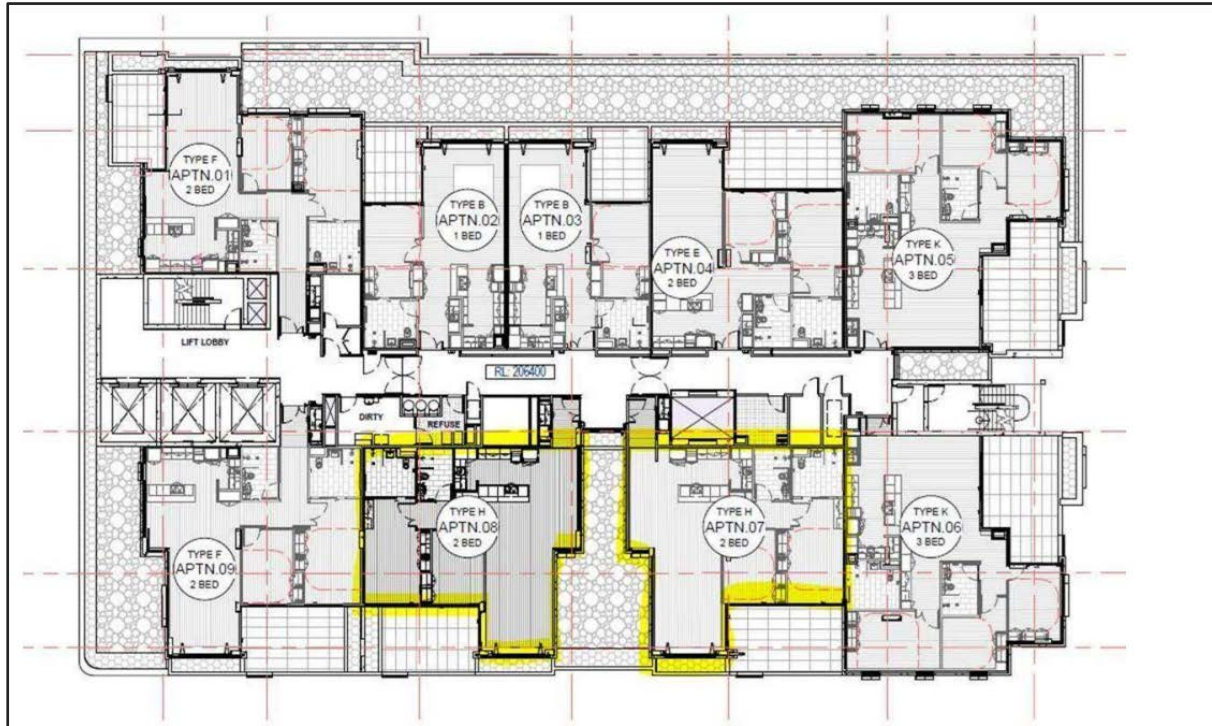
| Example apartments relying on a 'notch' or 'building indentation' for natural ventilation (Source: Applicant's Supporting Natural Ventilation Statement)
